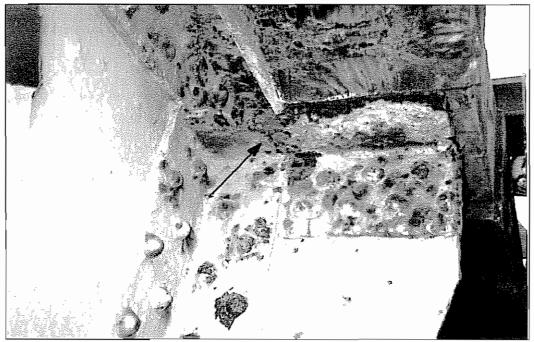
View shows the bottom flange of Floorbeam 6 of Span 1, right side, where 70% section loss was noted 15" from the end of floorbeam (arrow 1) and 40% section loss was noted 31" from the end of floorbeam (arrow 2).
